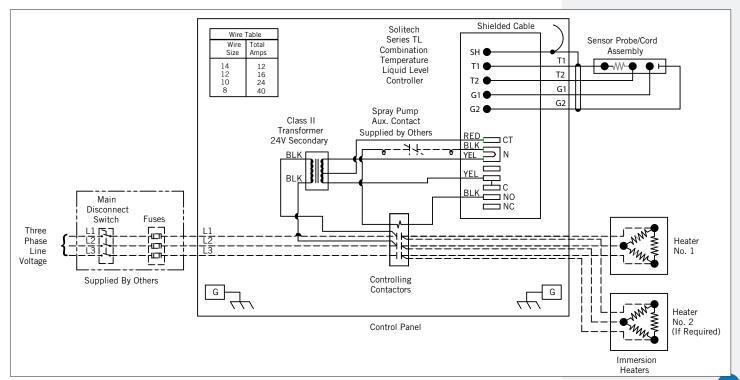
Example Wiring Diagram for Stand Alone BAC Heater Control Panel (Refer to Submittal Drawing for Specific Wiring Diagram)
